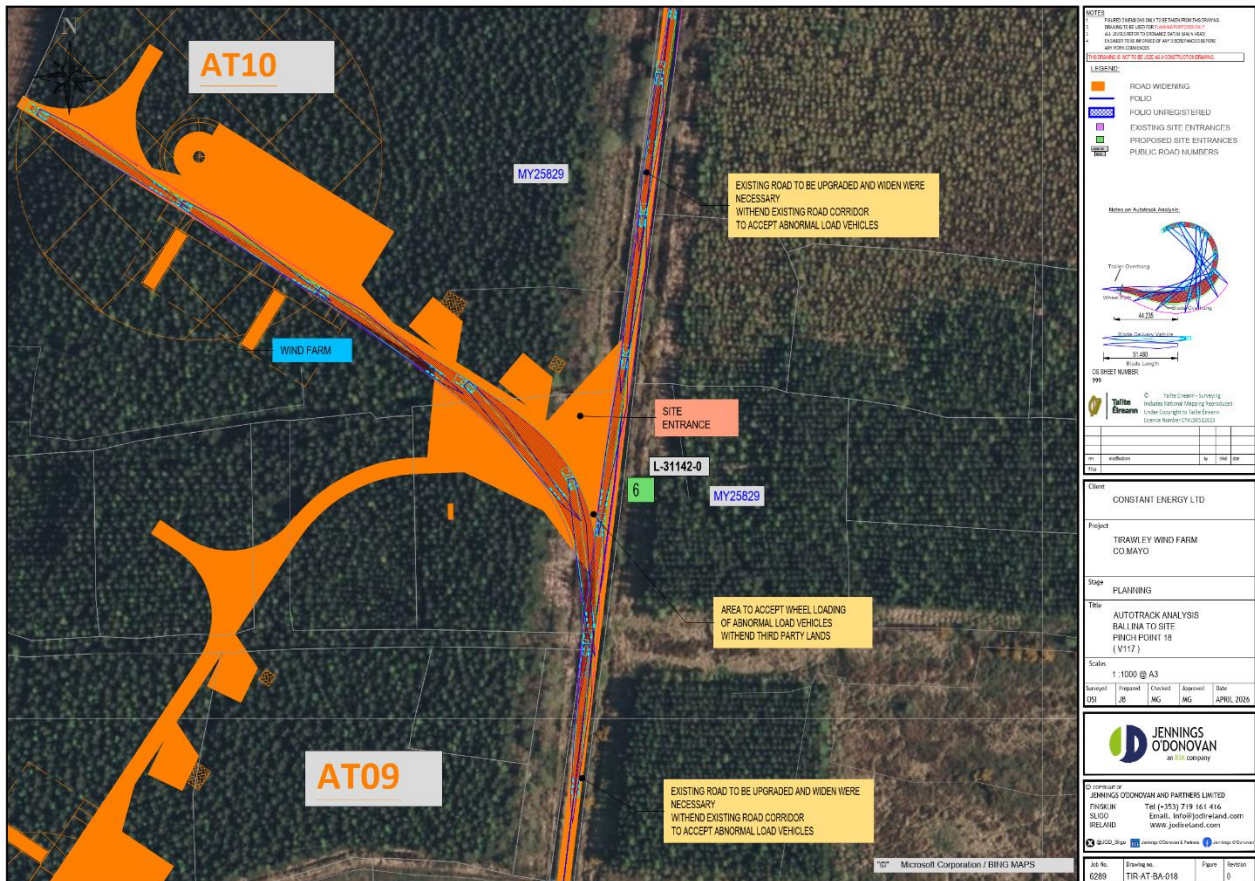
Auto Track Analysis Ballina to Site Pinch Point 18Plate 16 – Street View of Site Pinch Point 18Pinch Point No. 19:
